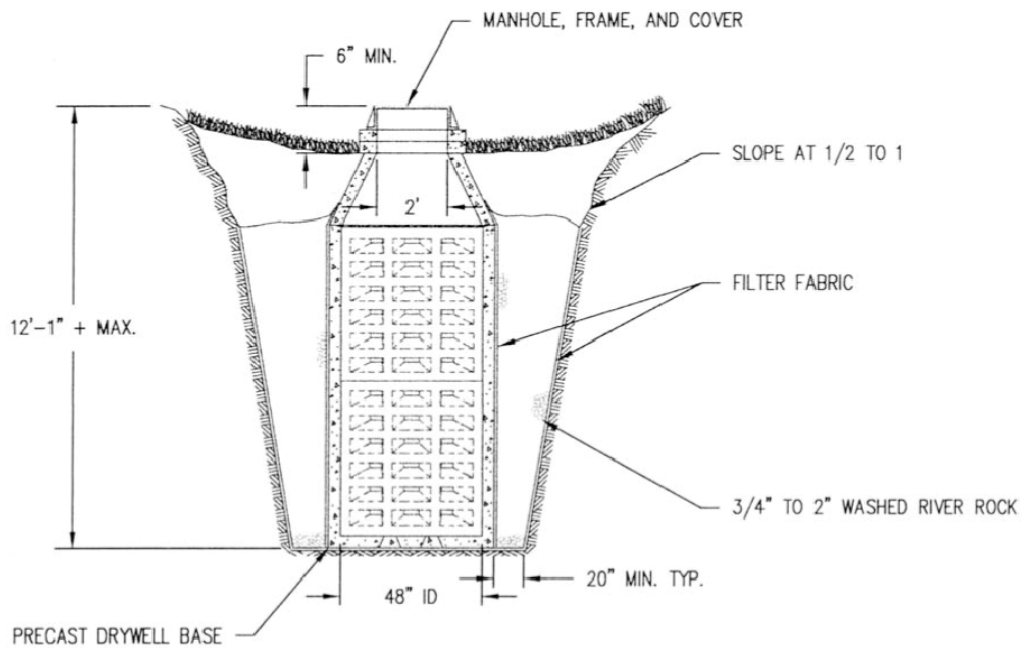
Typical drywell used in eastern Washington for general stormwater infiltration
